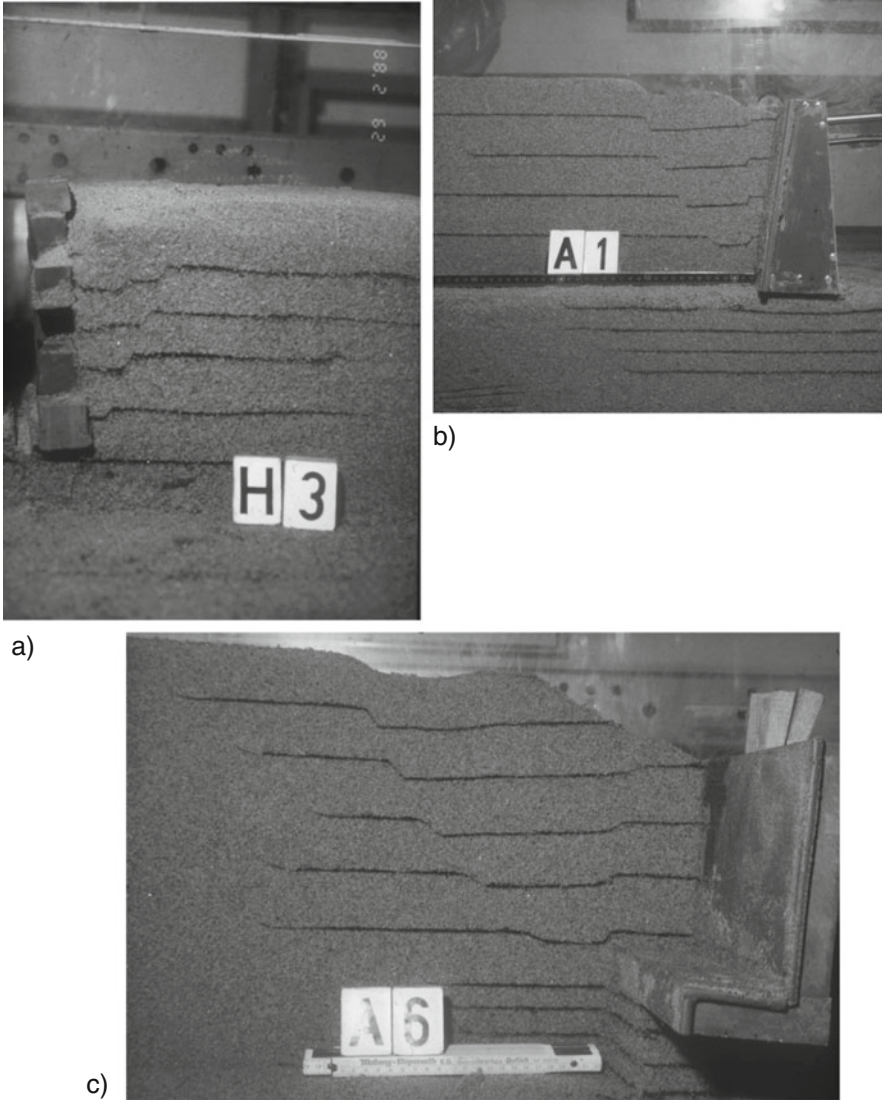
Displaced model retaining walls with sand (courtesy E. Schwing): (a) dry masonry, (b) gravity structure, (c) L-structure
